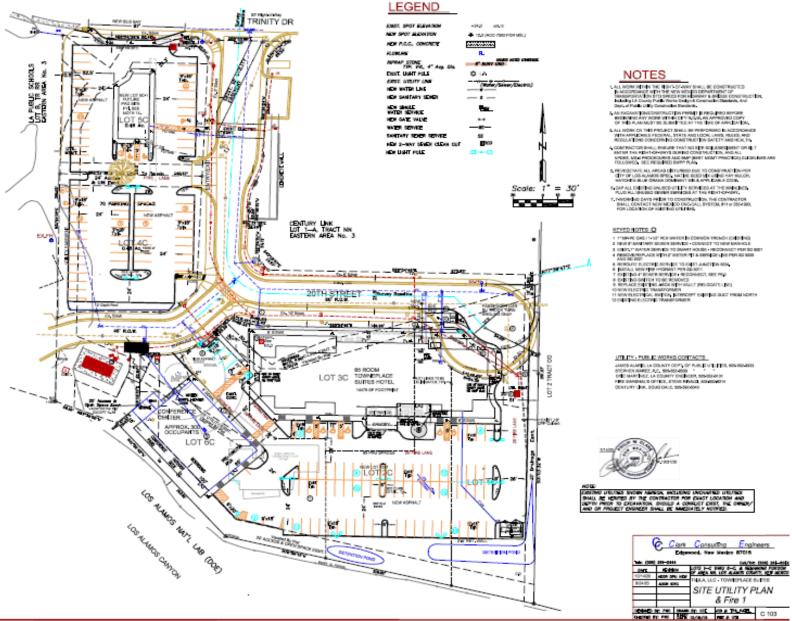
Site Plan Submittal Package (Revised 11-18-2020)
